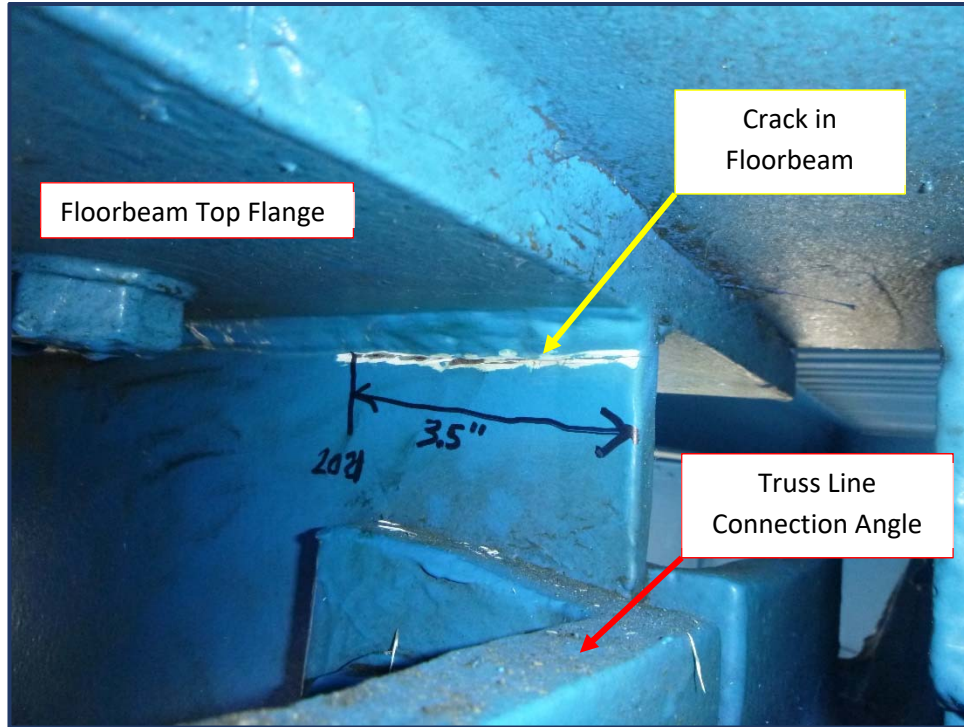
Cracks in Unit II Floorbeam Web at Top Flange, at Truss Lines
